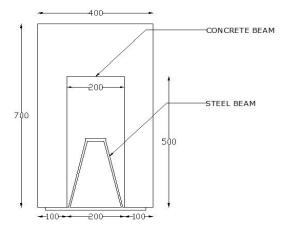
Cross sectional view of the steel beam with concrete beam for loading purpose
